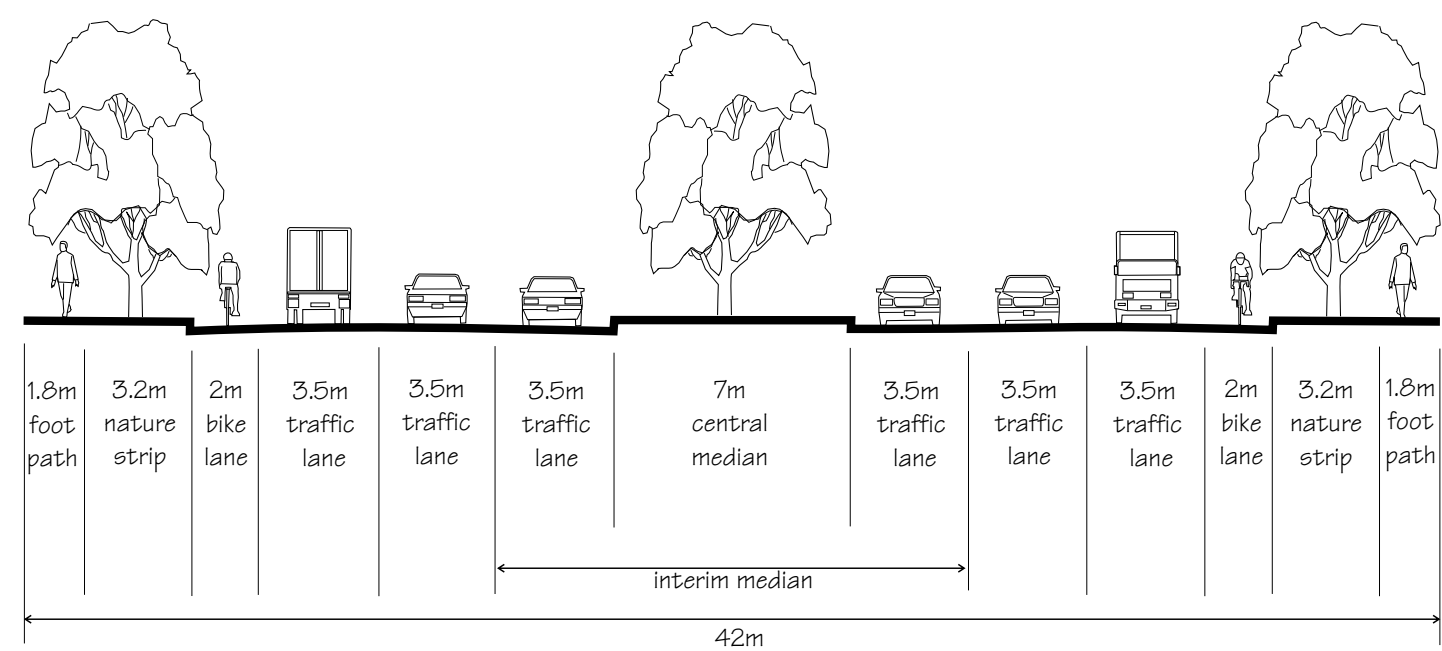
CROSS SECTION OF COLLECTOR ROADS
